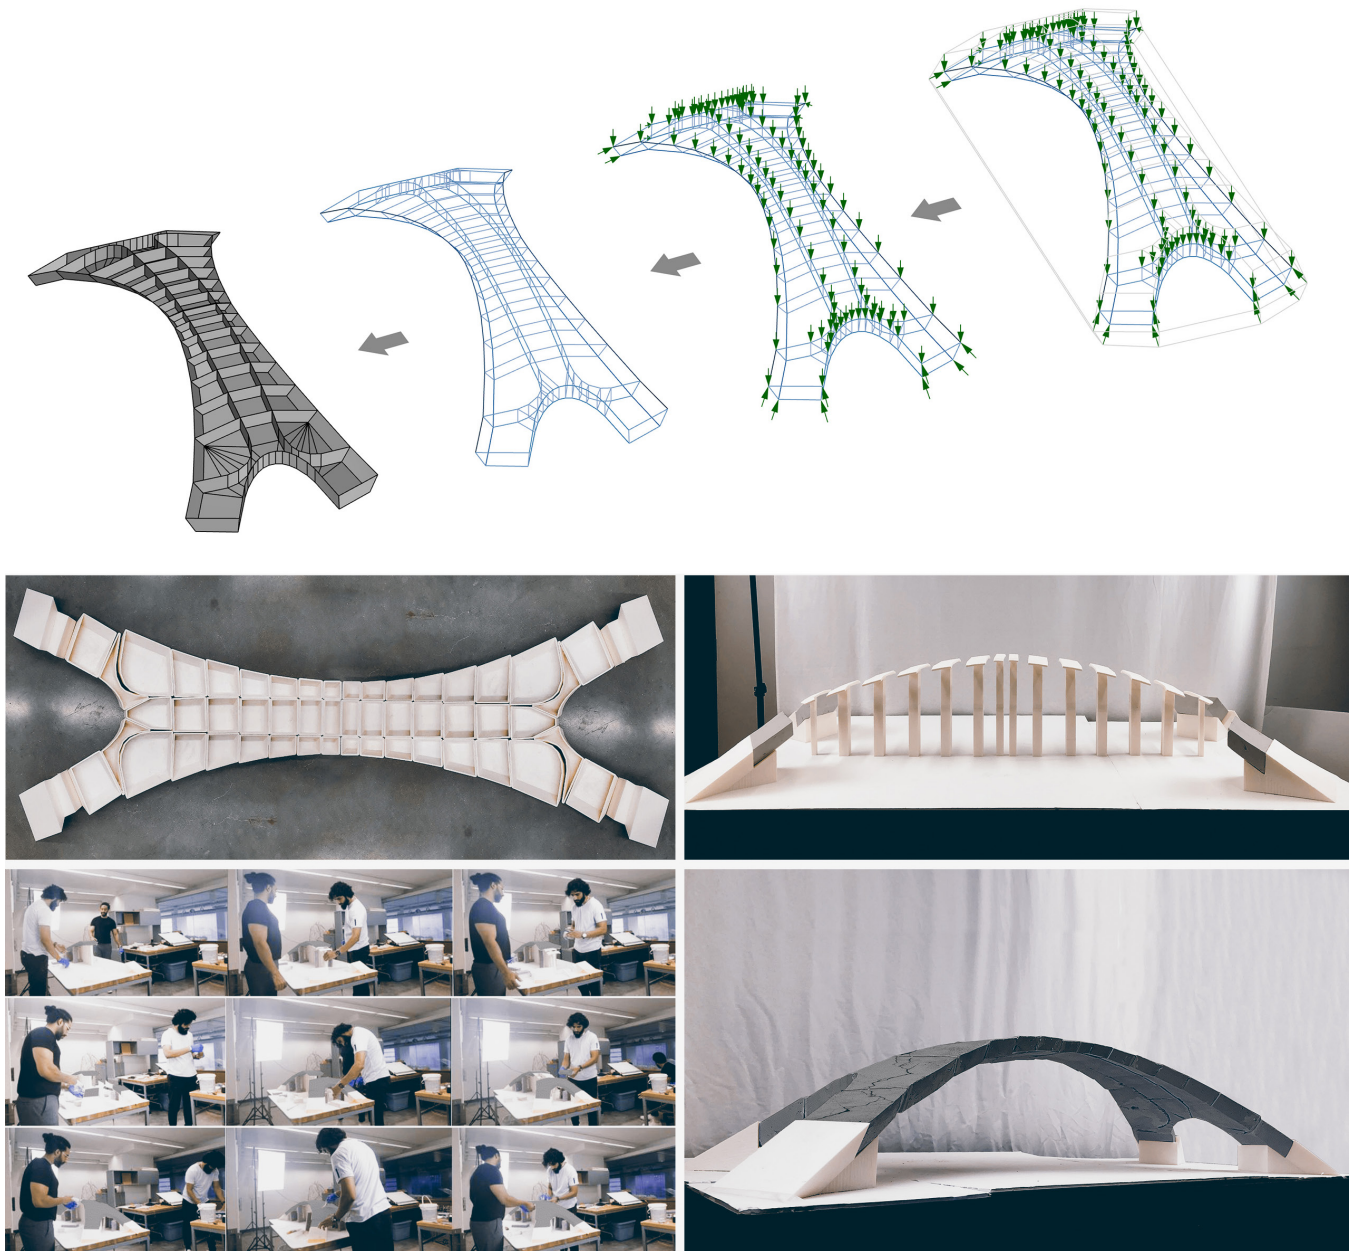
Creating the mold pieces from the Force Diagram, 3-D printed molds, formwork, assembly process, and assembled bridge.
